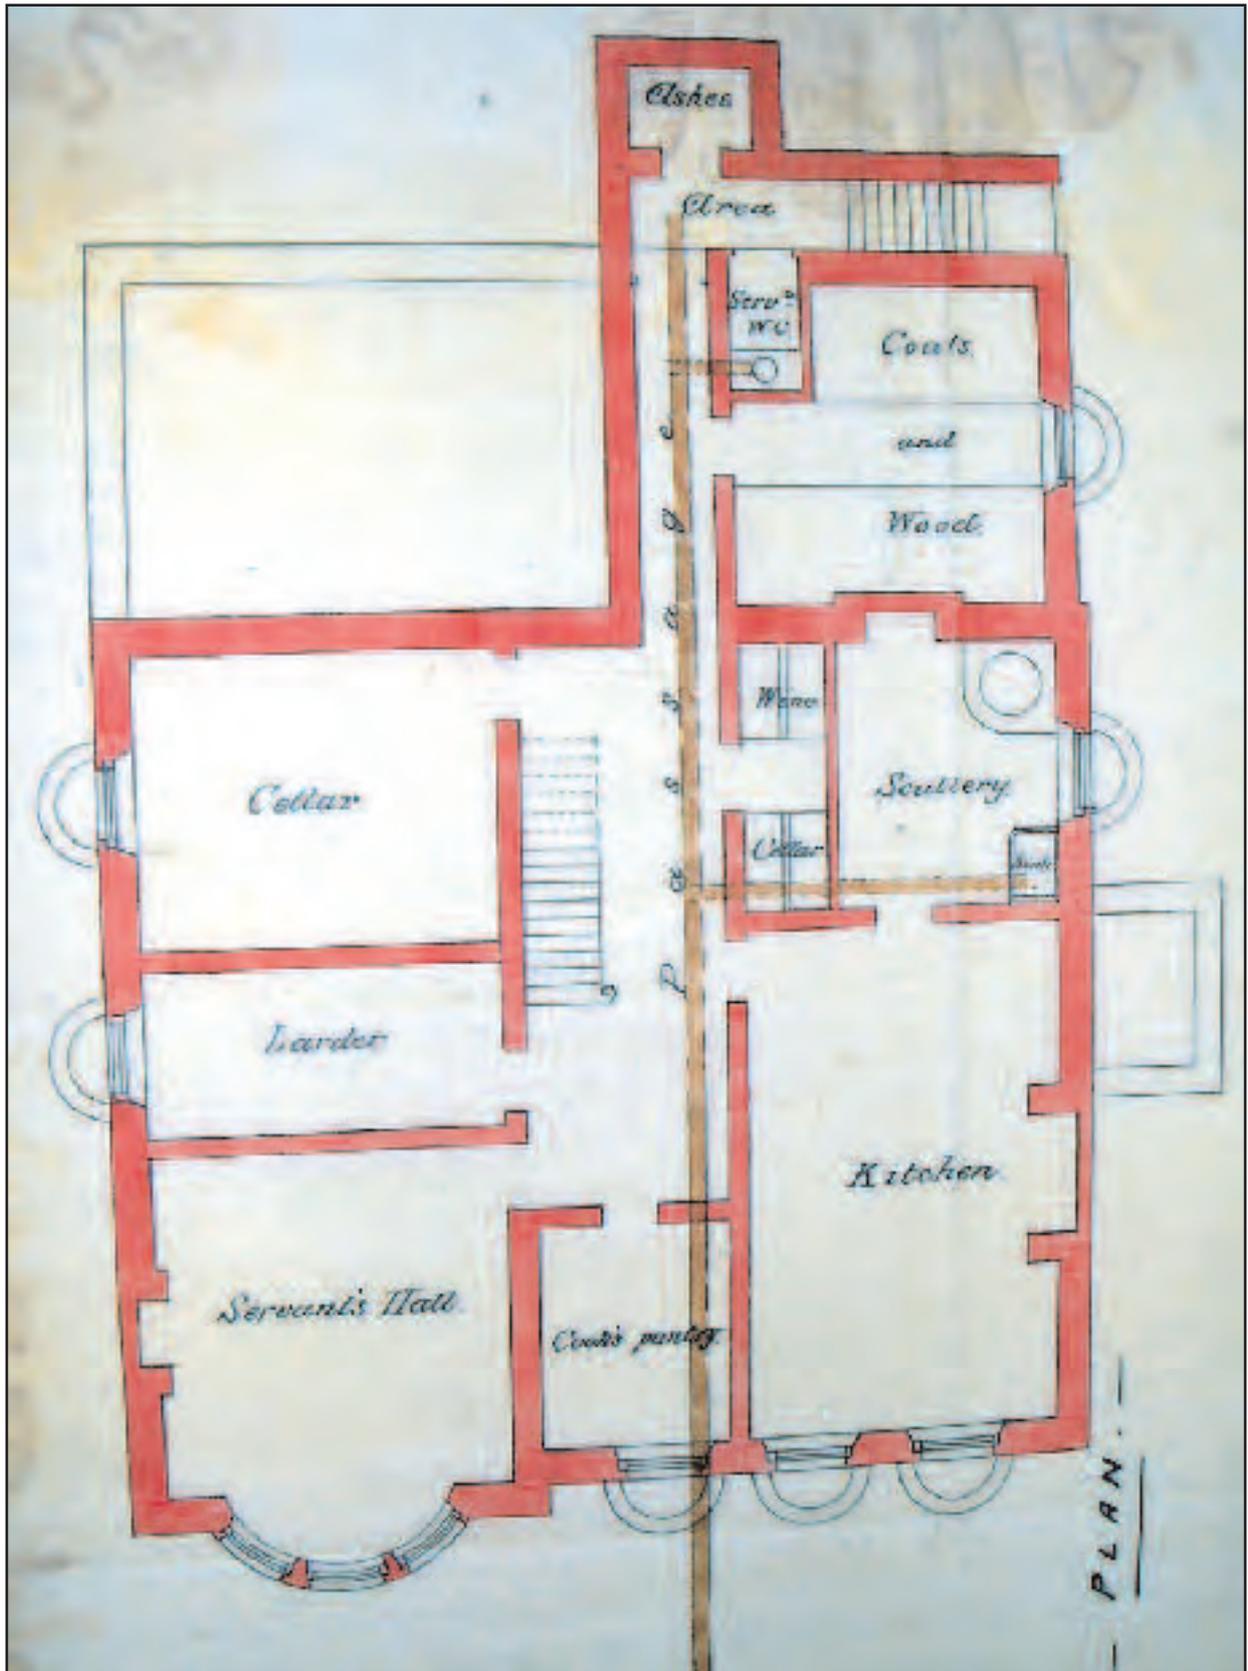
Basement plan of Parklands (now 27 Tyndalls Park Road), 1860
